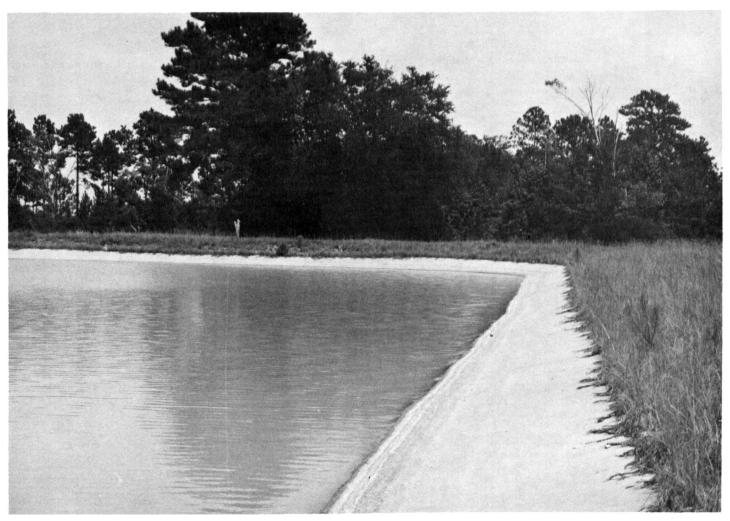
A concrete-lined sewage lagoon on Harleston fine sandy loam, 2 to 5 percent slopes. The lining is needed because the soil is too permeable for this use.
